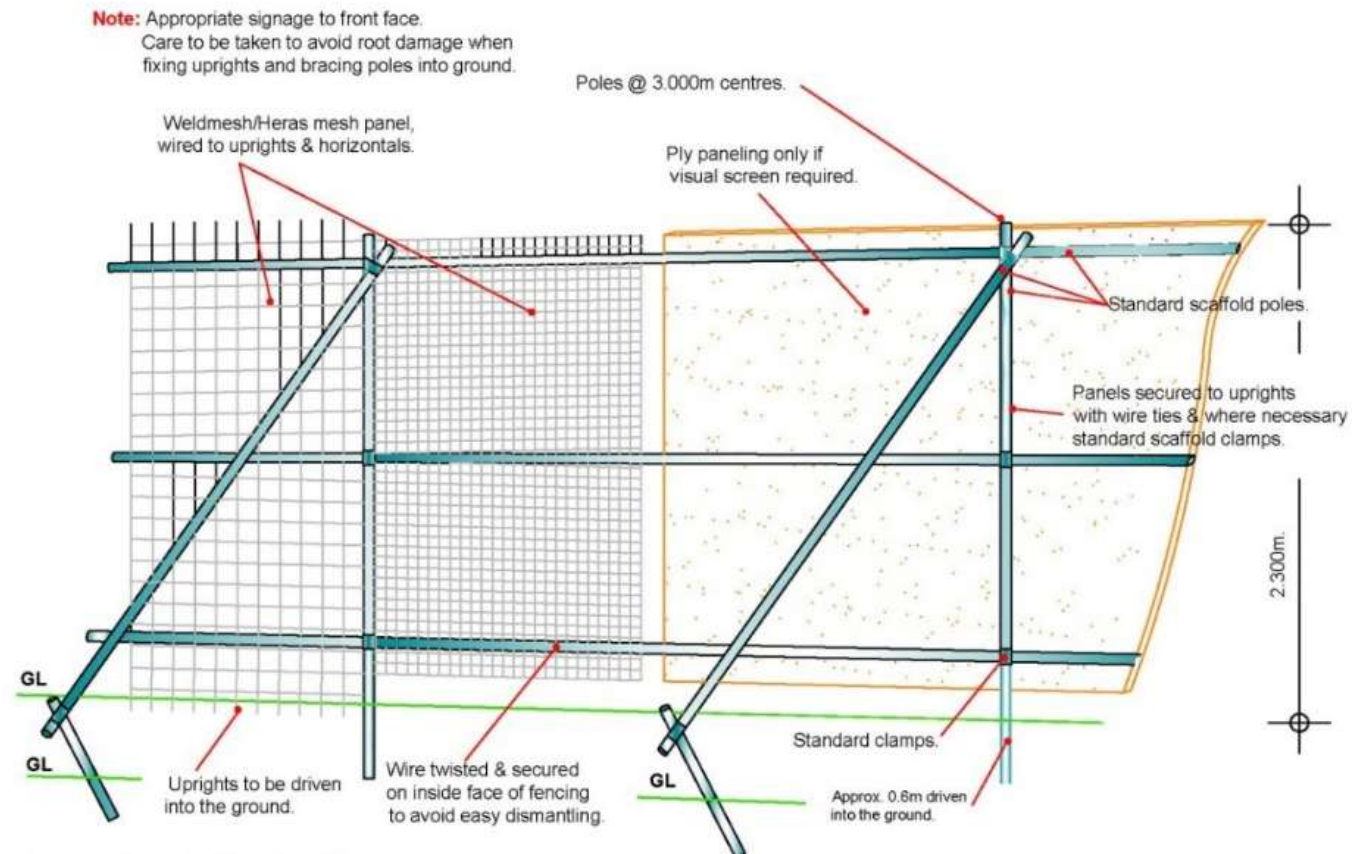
Typical Detail: Tree Protection Fence to BS5837.
